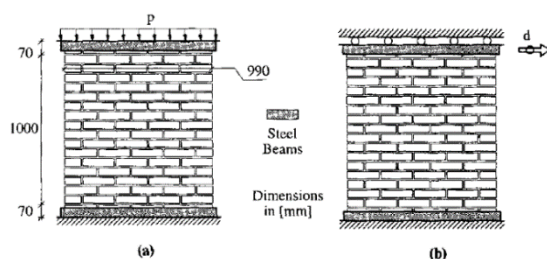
Loading of the specimen: (a) Vertical Loading; (b) Horizontal Loading [28]
